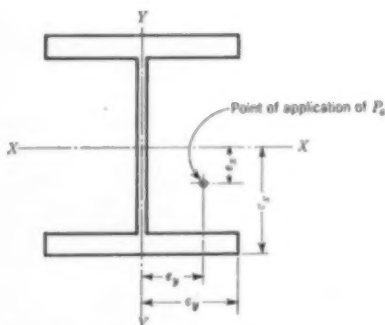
SECTION of eccentrically loaded wide-flange column shows derivation of basic equation, Eq. 1.
